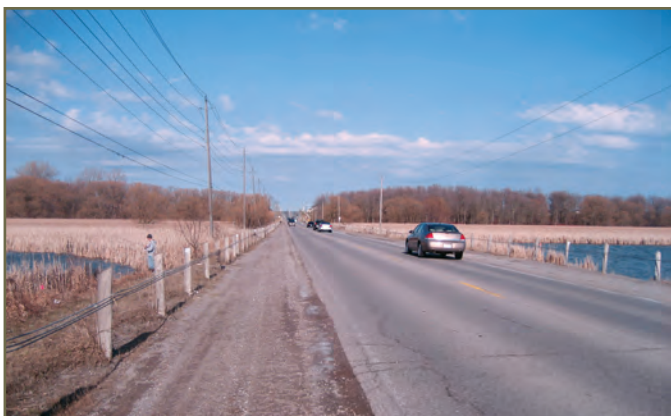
Road bisecting open water wetlands, Victoria Street, Whitby, Ontario.
